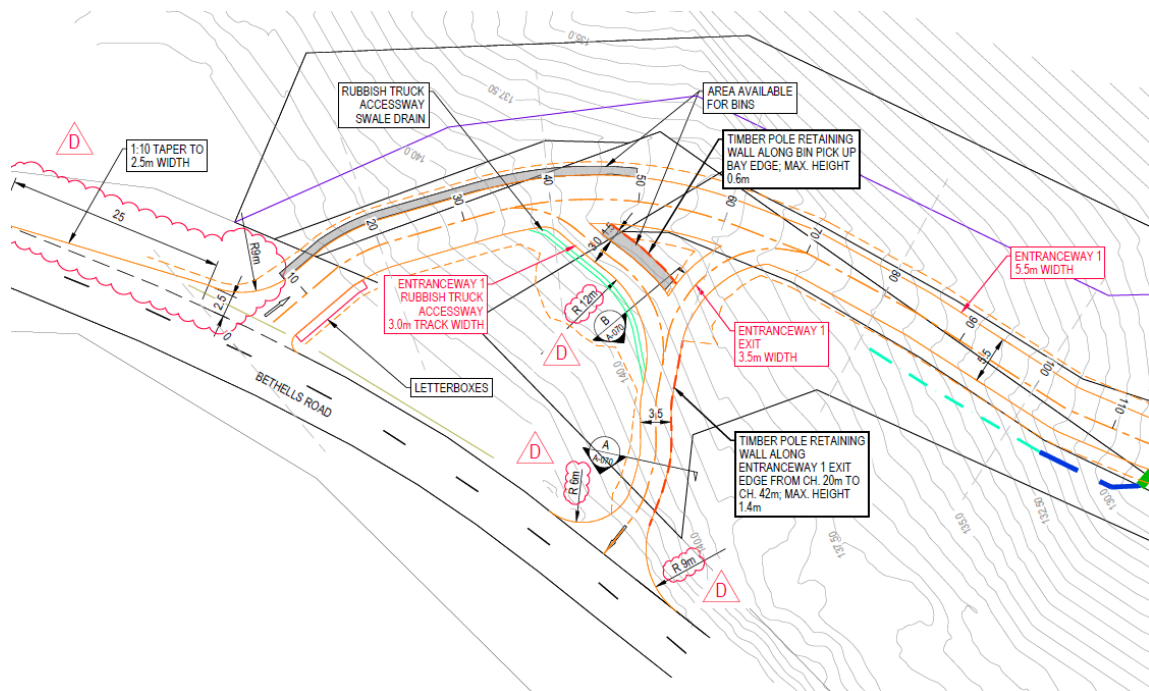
Proposed new site entrance (Source ACH DWG No. A-050)
